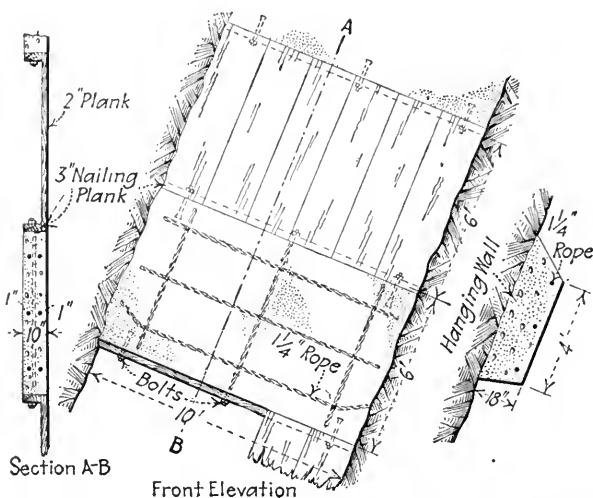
CONCRETE AND PLANK DIVIDER.
